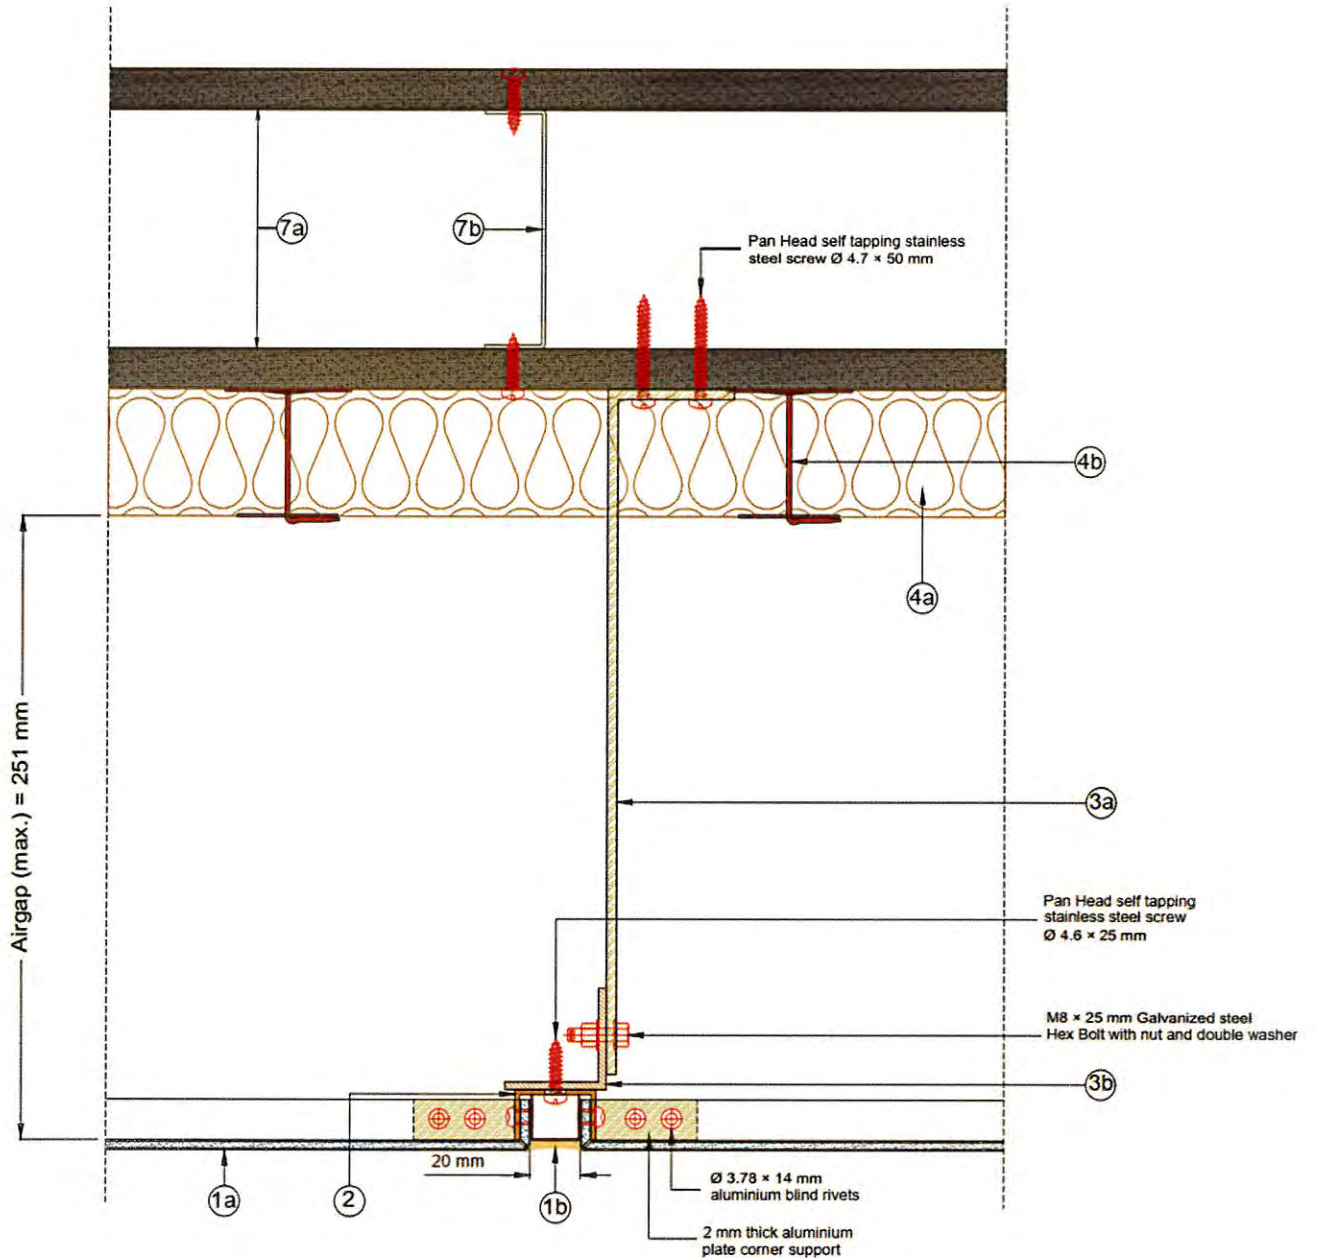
"Emerge U.K. FR A2" 4 mm thick Aluminium Composite Material Exterior Wall Cladding Assembly horizontal section joint details
